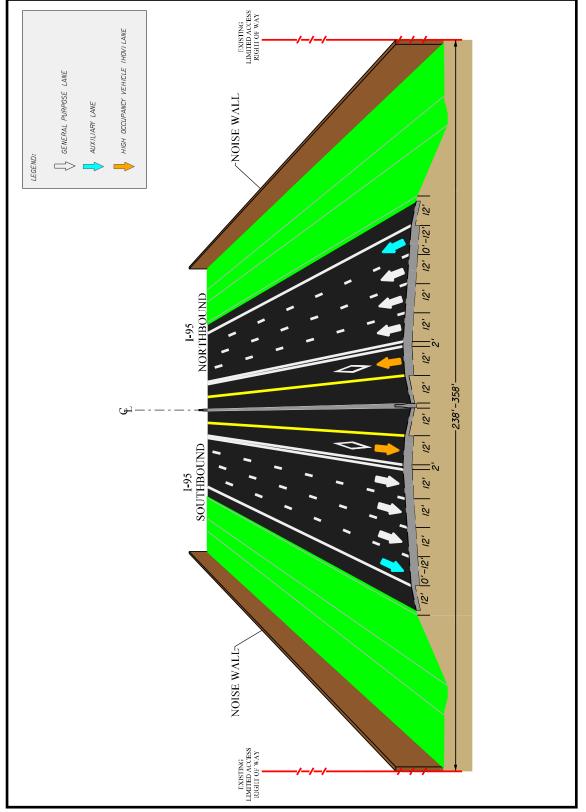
Existing Typical Section between Commercial Boulevard and Glades Road
